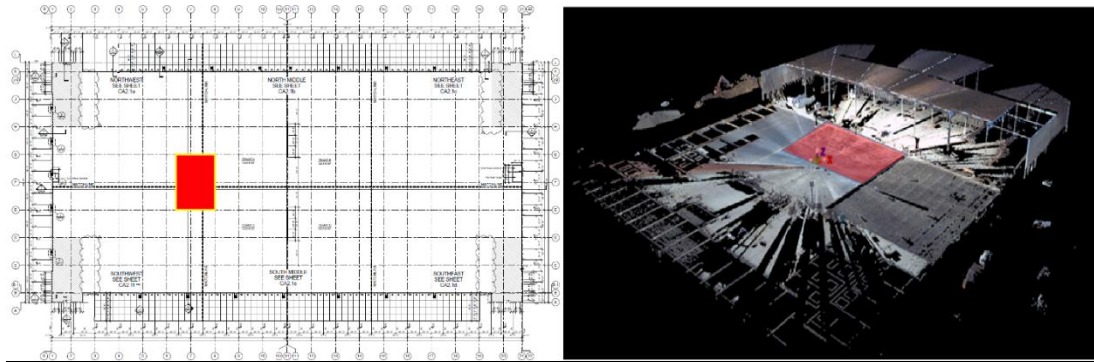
The floor plan (left) and the 3D point cloud (right) of the warehouse building. The area of interest is highlighted in red.
